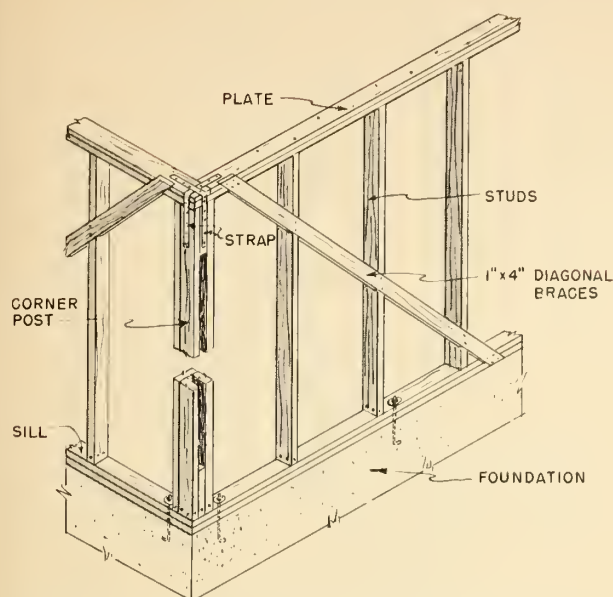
Diagonal bracing and steel strapping used to strengthen end walls.
